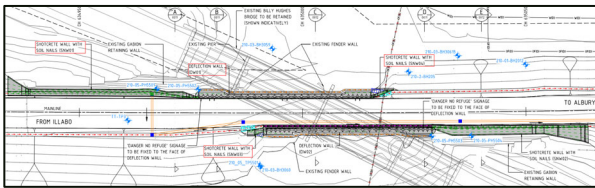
Deflection wall and soil nail wall alignment at the Billy Hughes bridge site
